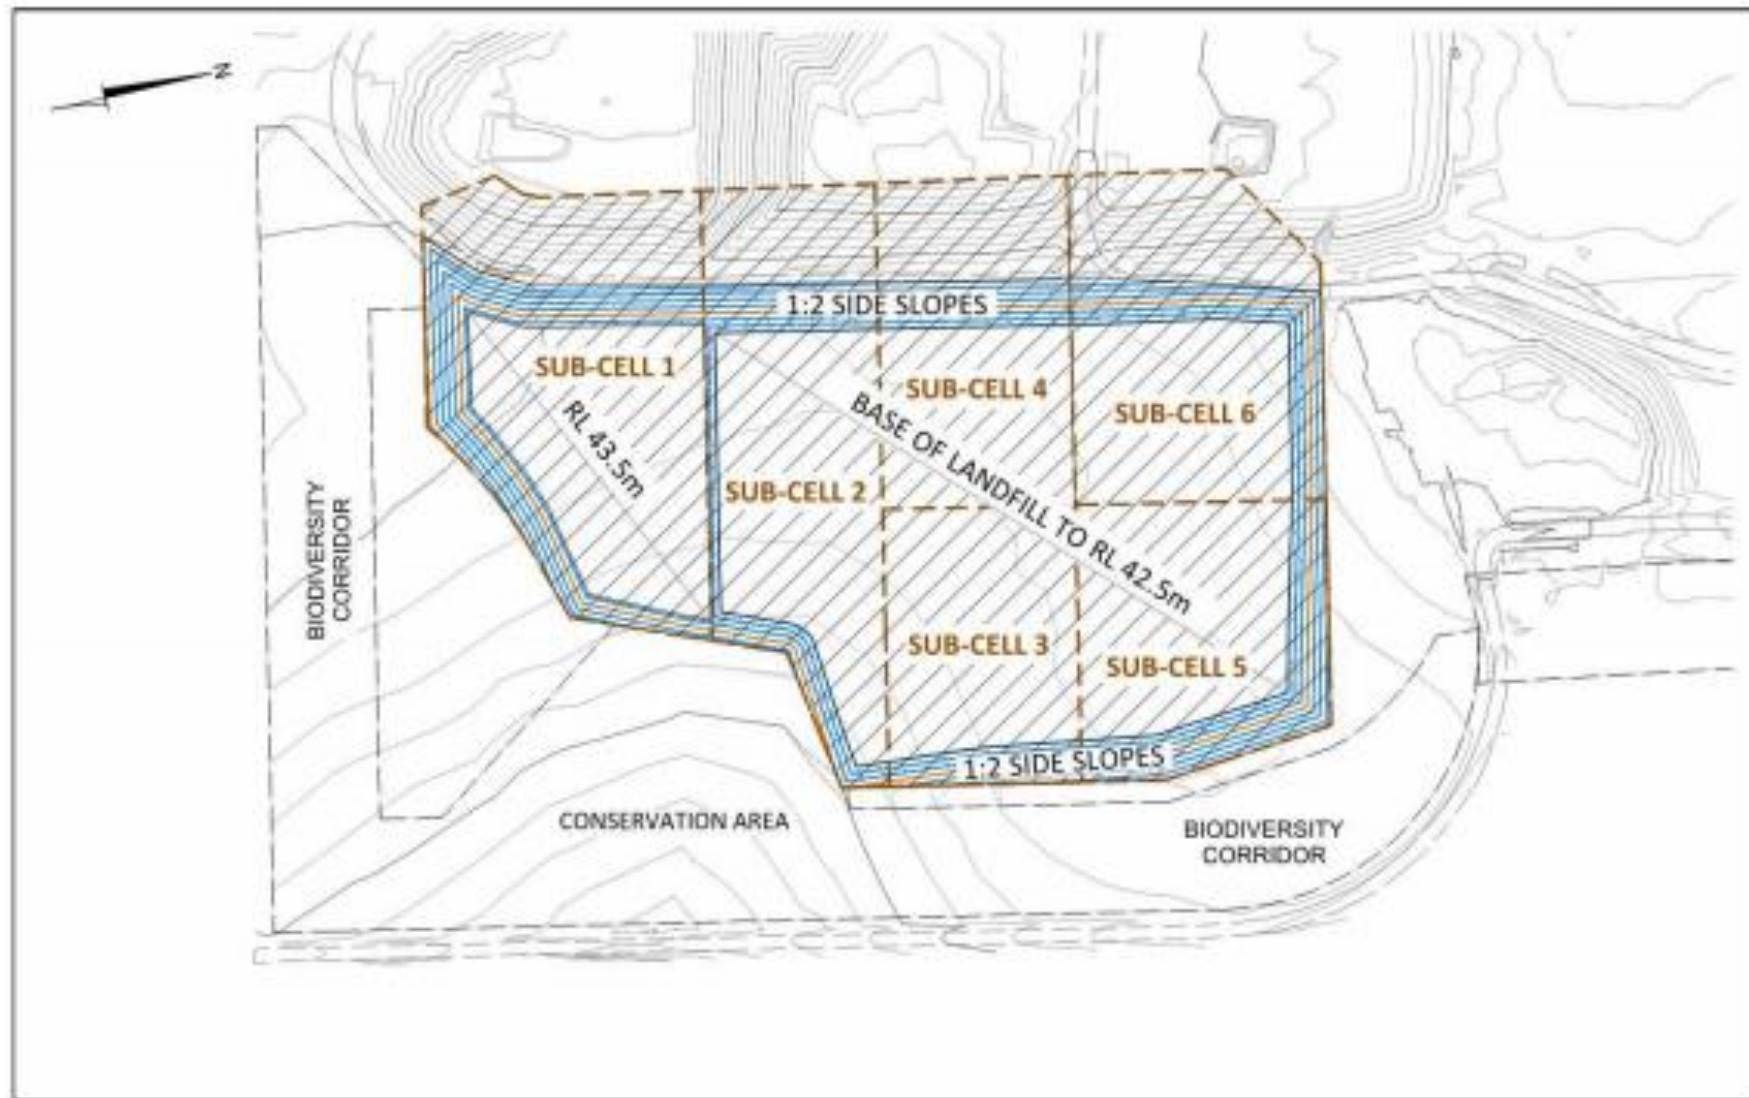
Proposed Landfill Cell Sub-Stages Layout
